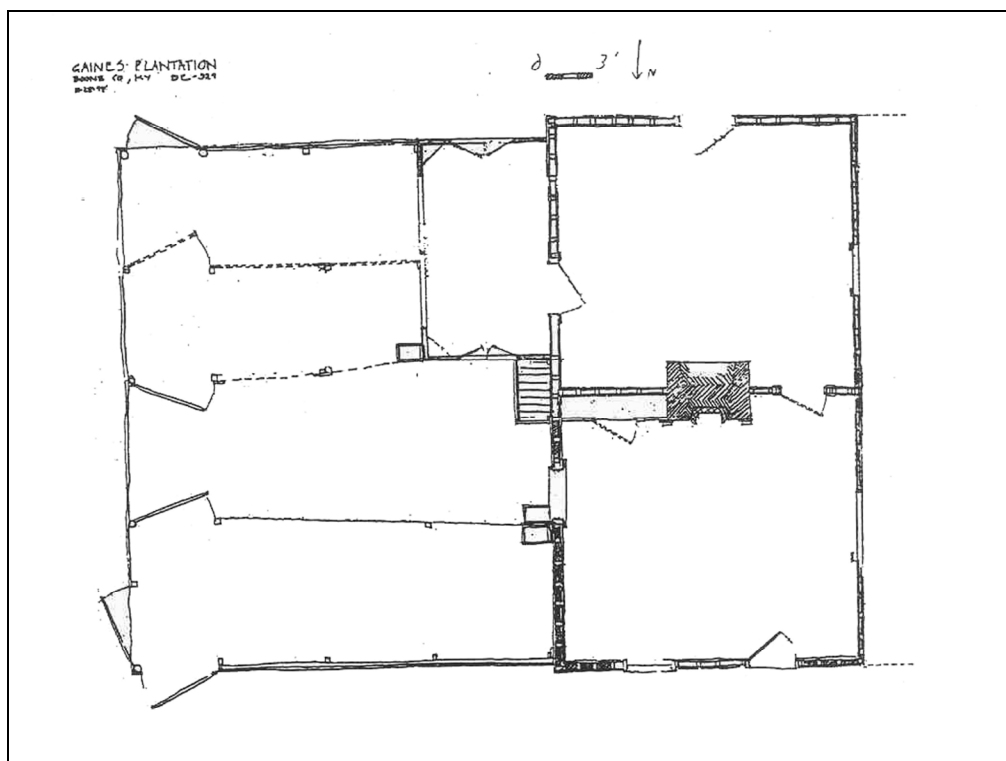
Floor Plan of Two-Room Frame Structure, with Shed Additions.
